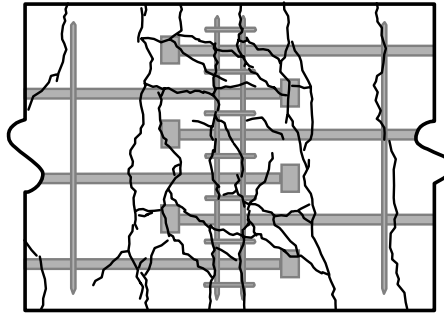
Crack development in the transverse stirrup cage test (specimen LS-08-04.04-12-10(N)-1-TTD) (continued)
